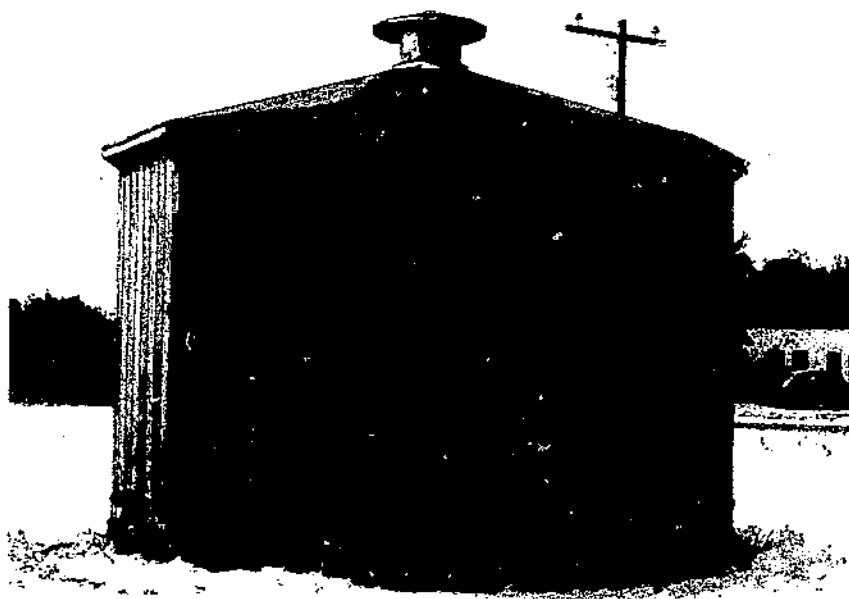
Twelve-sided wood bin, at Jamestown.
